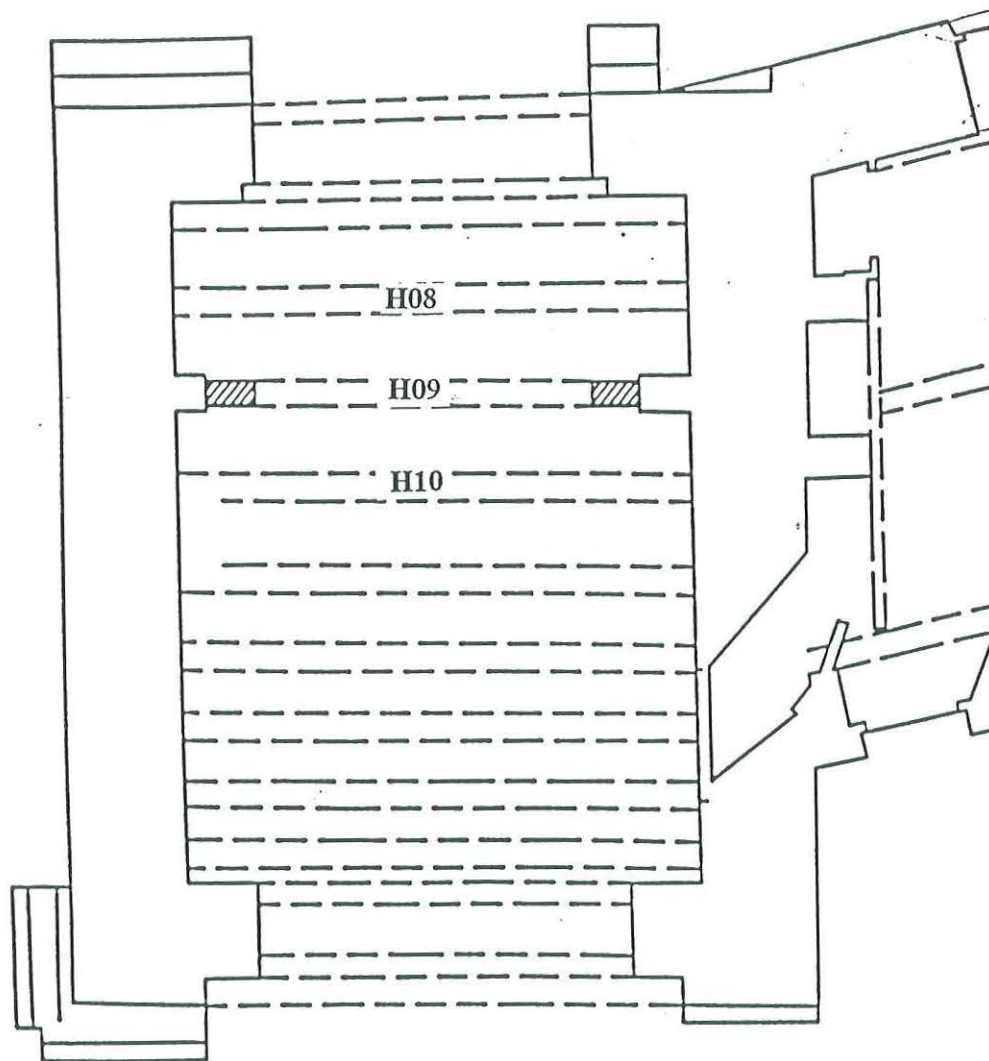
Plan to show positions of samples from the roof of the gatehouse
